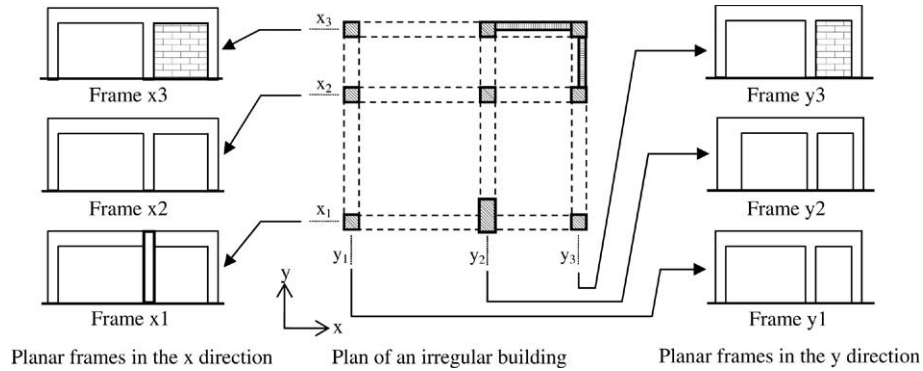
Plan of an irregular building and frames used in planar decomposition.
